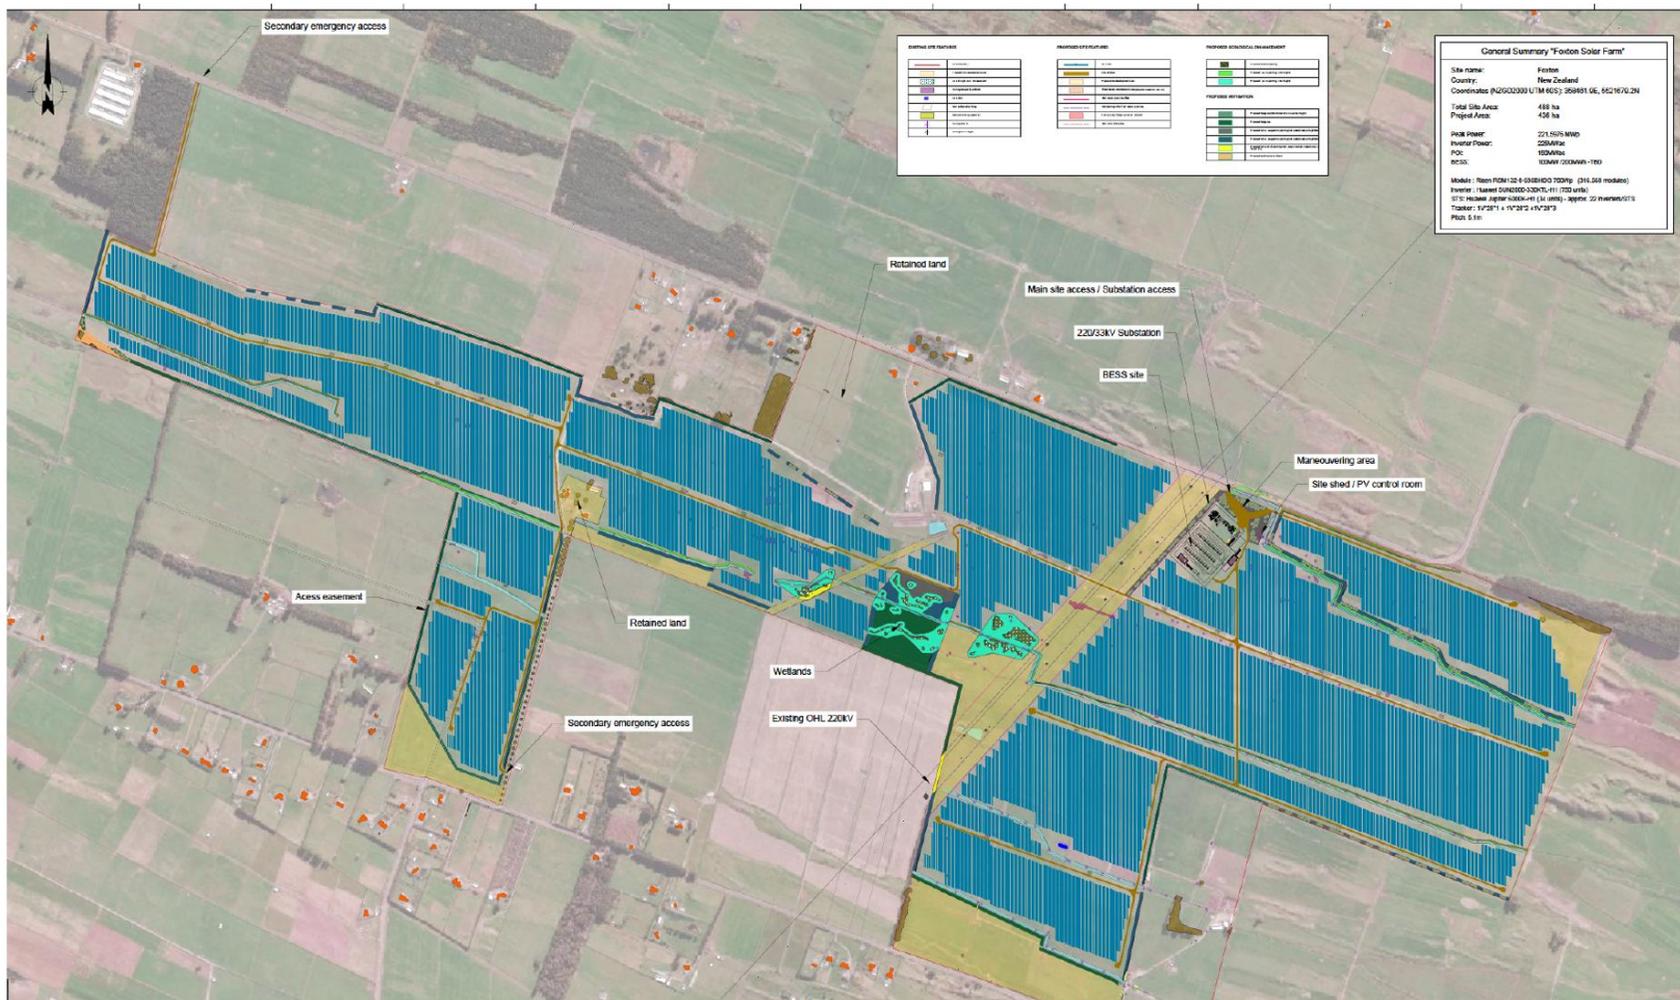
Layout plan of the proposed solar farm (source: FRV)
